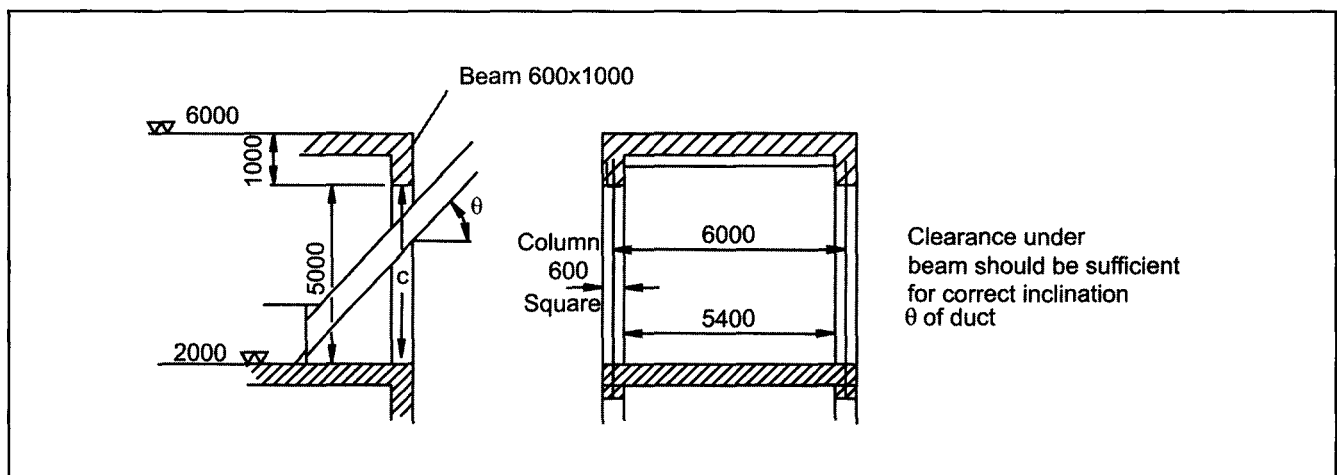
Clearances for machinery and ductings - in buildings.
